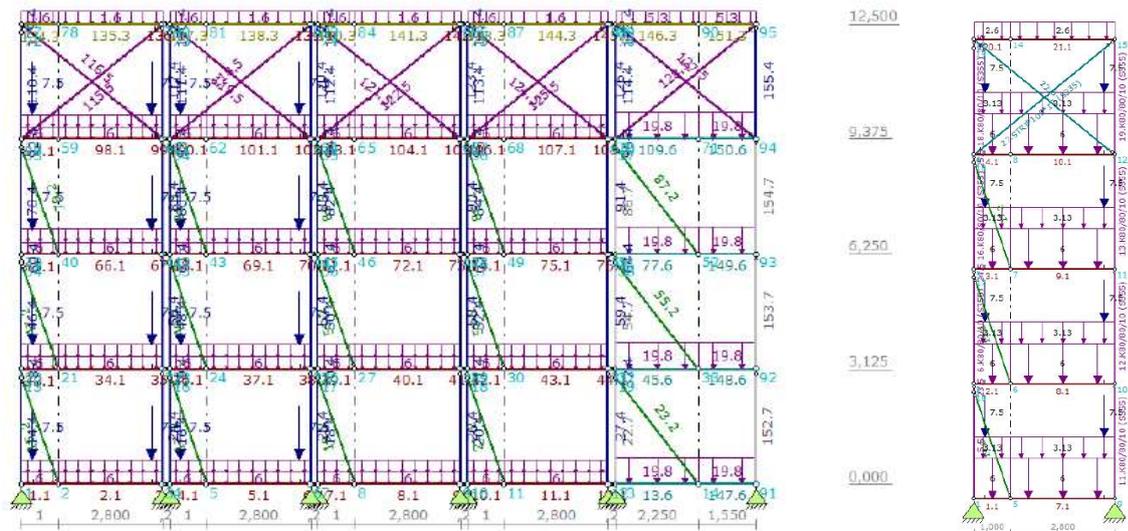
Transverse stability scheme (Pieters Bouwtechniek).
